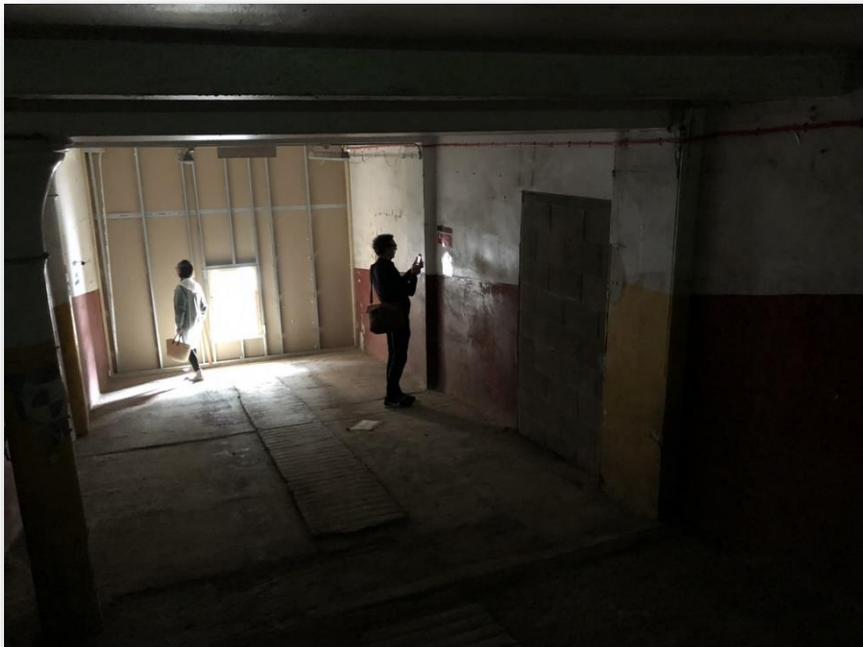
Ramp area showing partition to street frontage and blocked up former doorway to restaurant unit on the right
